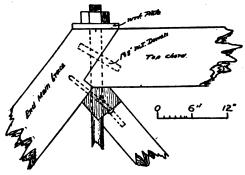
Top Chord End Joints for Howe Truss Spans up to 90 ft.
